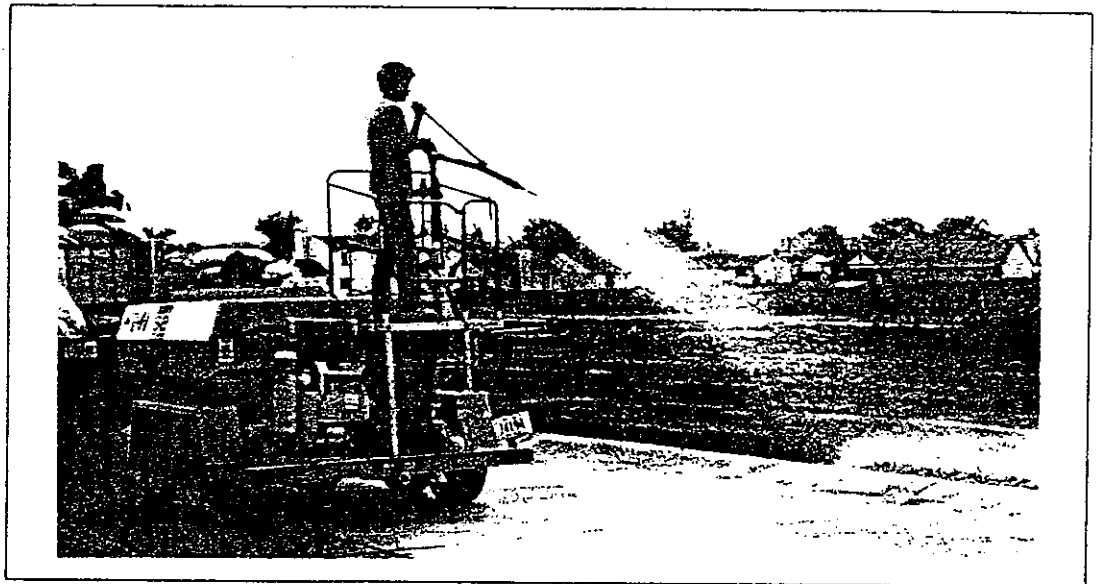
F. Hydroseeding the roadside in a new subdivision.
